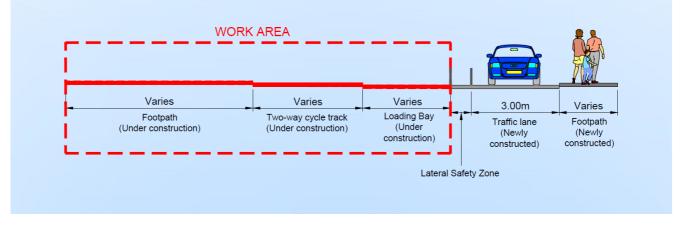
Traffic Management Cross Section, Section 5h – Stage 2
